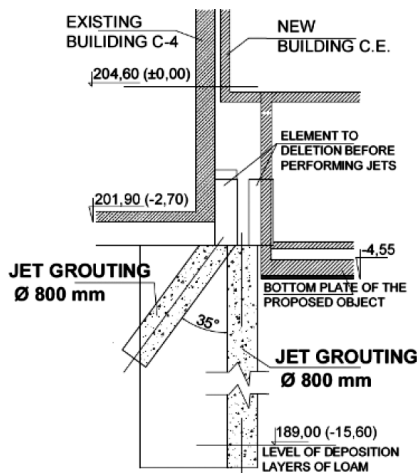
Cross-section of the foundation of buildings C-4 and C.E
